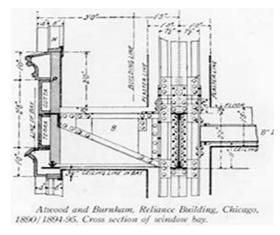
Curtain Wall Detail, Reliance Building. Source: tboake@sympatico.ca
